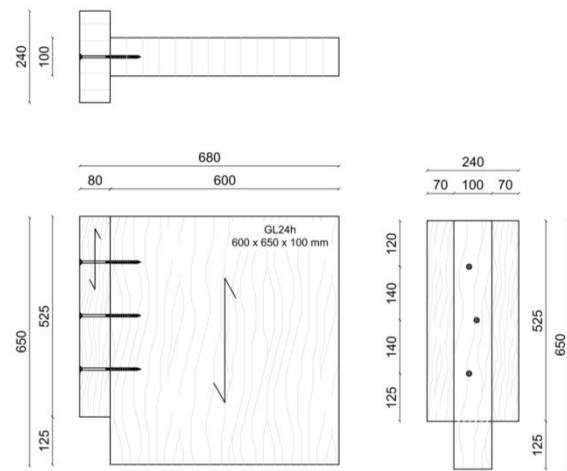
geometrical properties of specimens for screwed timber-to-timber connection tests
